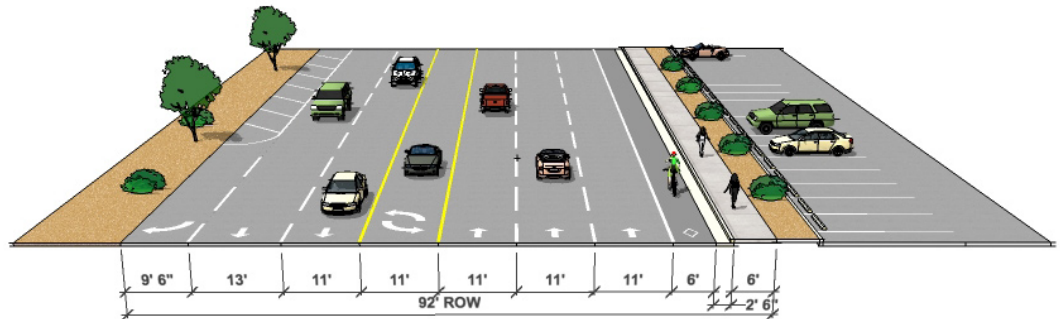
cc: Eubank Boulevard's 2009 Cross Section just North of Southern Boulevard
